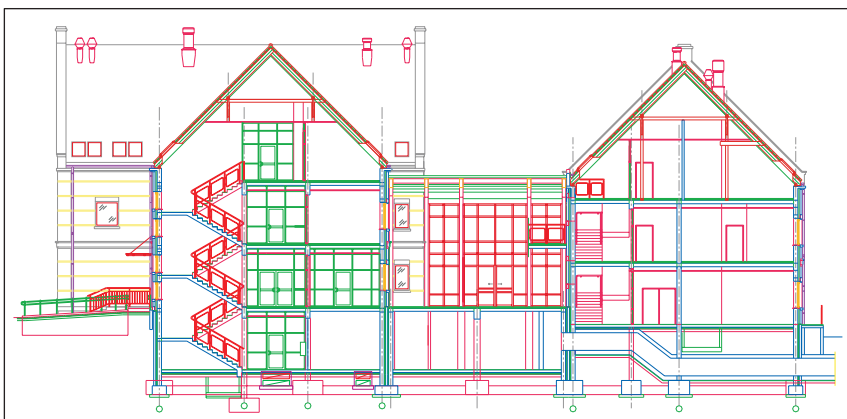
The vertical cross-section of the building. Author: M. ZAGROBA
